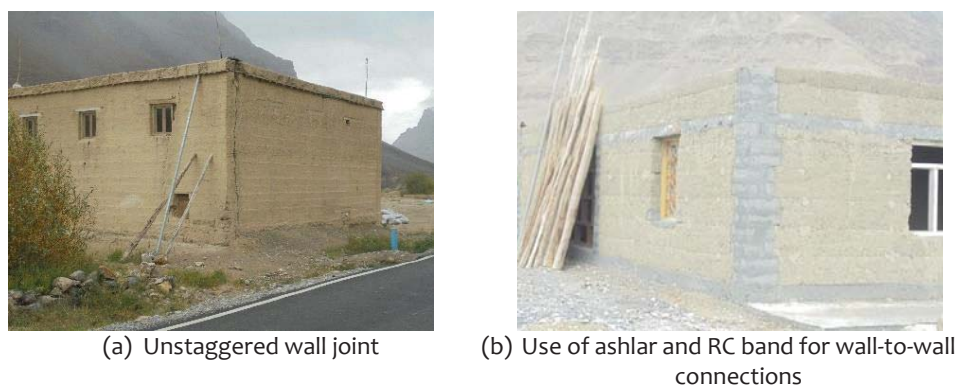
Wall-to-wall joints in rammed earth buildings
